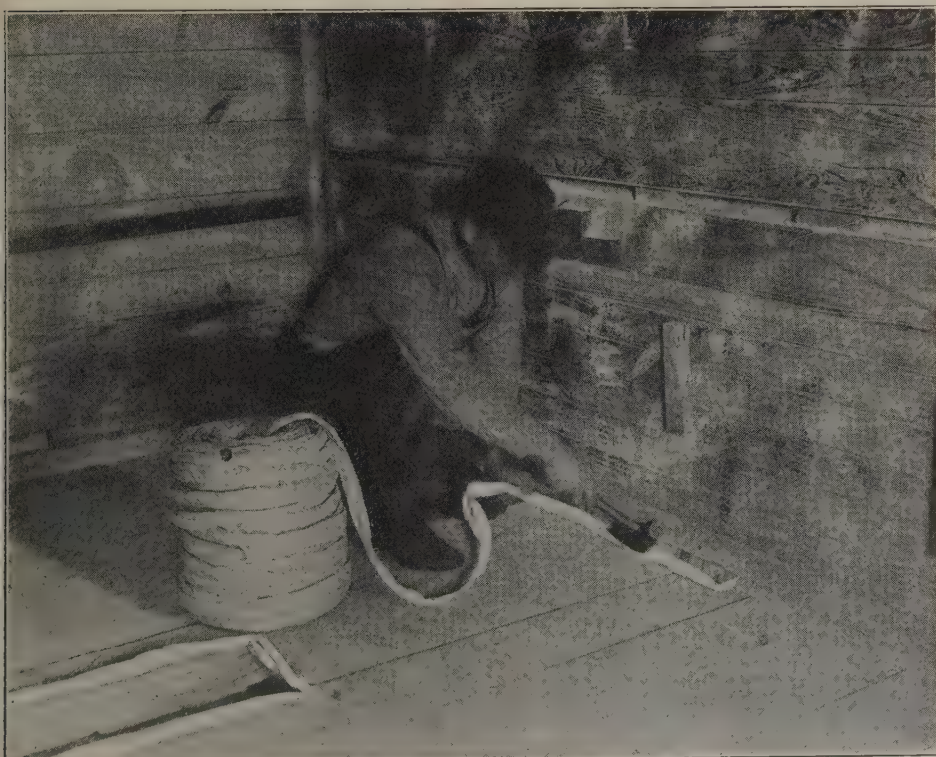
Calk Cracks, Caused by Short Floor Boards, with Schmitz Calking Paper.
